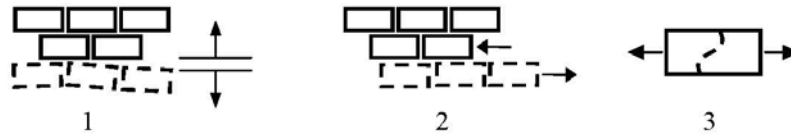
Dominant failure modes in masonry units: (1) joint de-bonding, (2) units sliding along bed or head joints and units cracking under direct tension ([41] p. 123).
